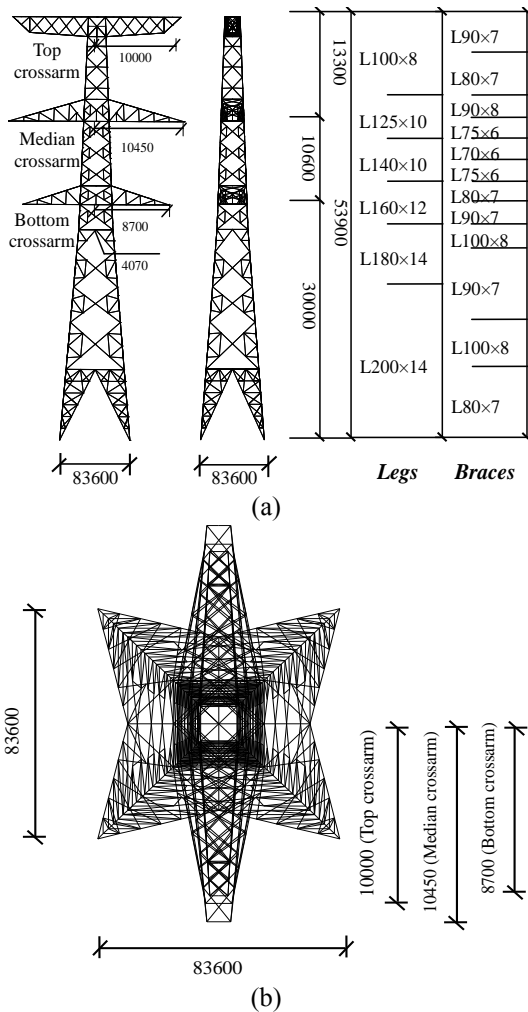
Configuration of the transmission tower: (a) elevation; (b) plan (unit: mm)
